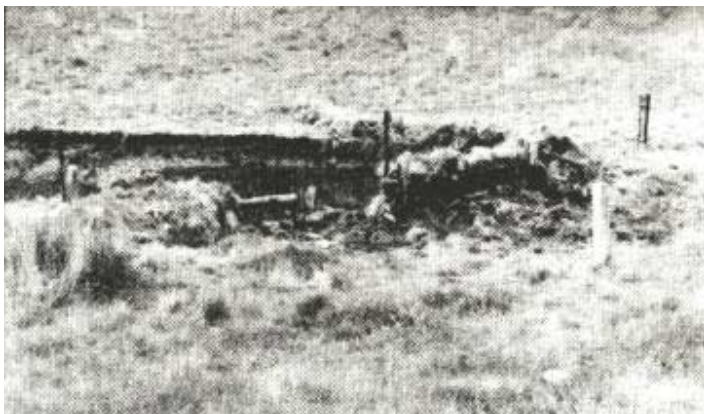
This hobby farmer's attempt at dam building may lead to erosion
